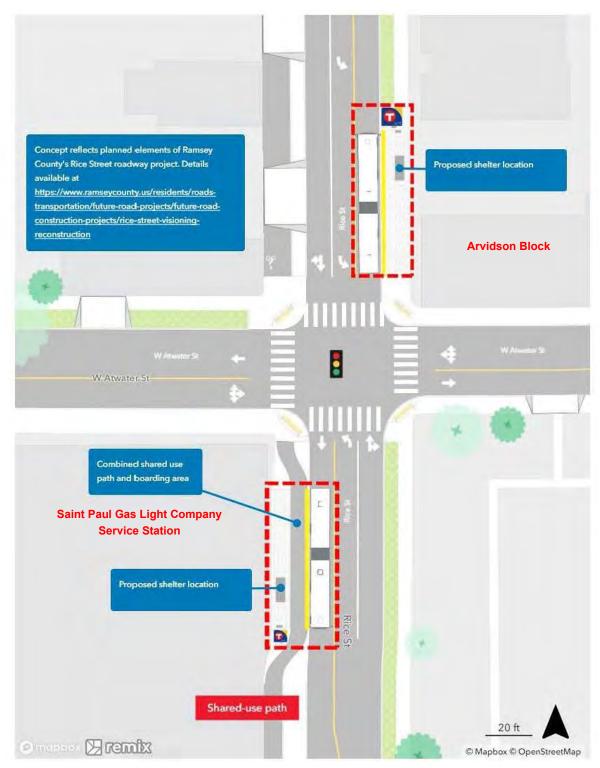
Rice Street and Atwater Street Station Concept Plan in area of the Saint Paul Gas Light Company Service Station.
